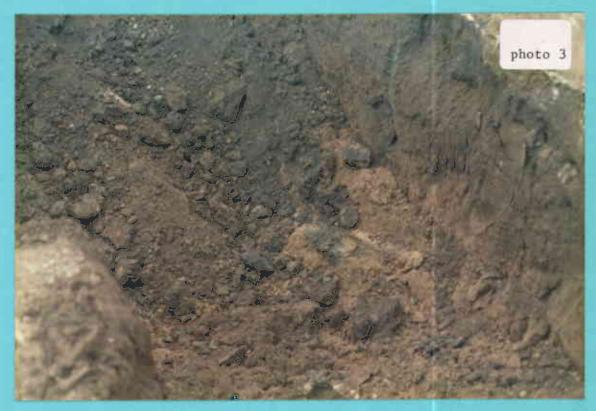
Bottom of excavation at north end showing light colored (uncontaminated) soils where conformation sample Sunol No. 5 was taken.
